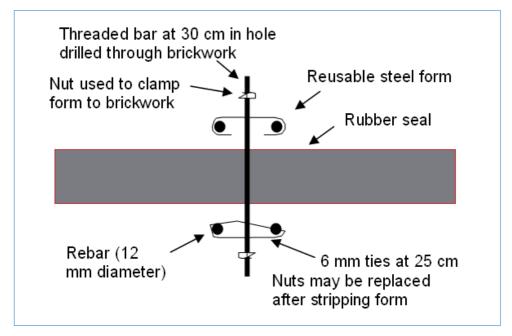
Strengthening of existing masonry construction with reinforced concrete posts and beams
